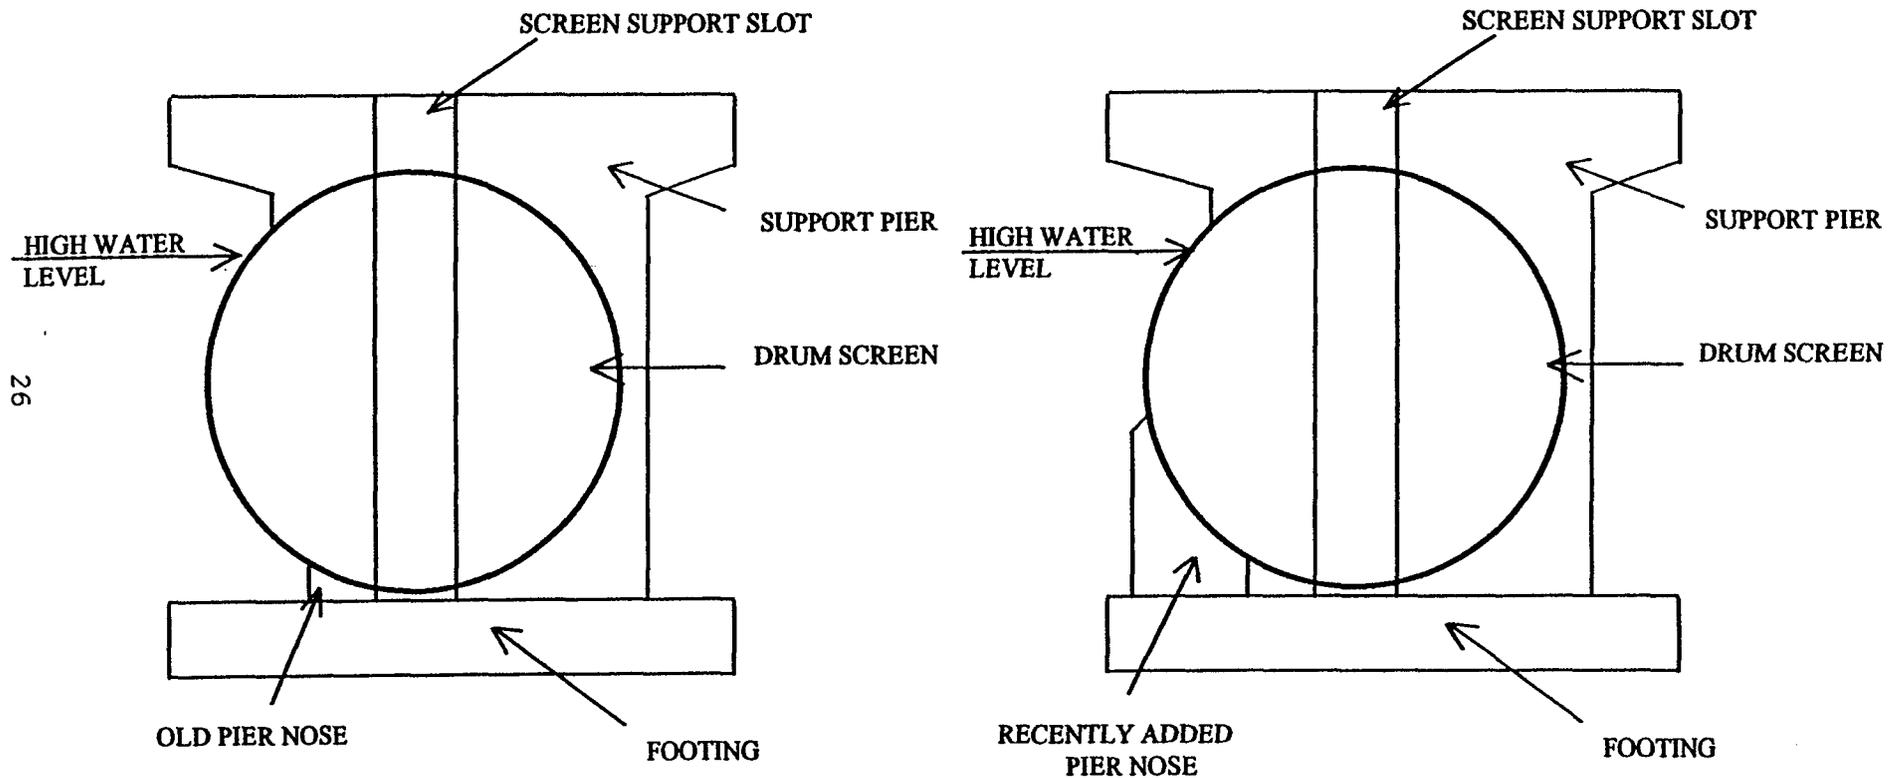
Cross-sectional profile of the Woodbridge Irrigation District fish screen concrete support piers showing original construction (left) and recently added pier nose (right).
